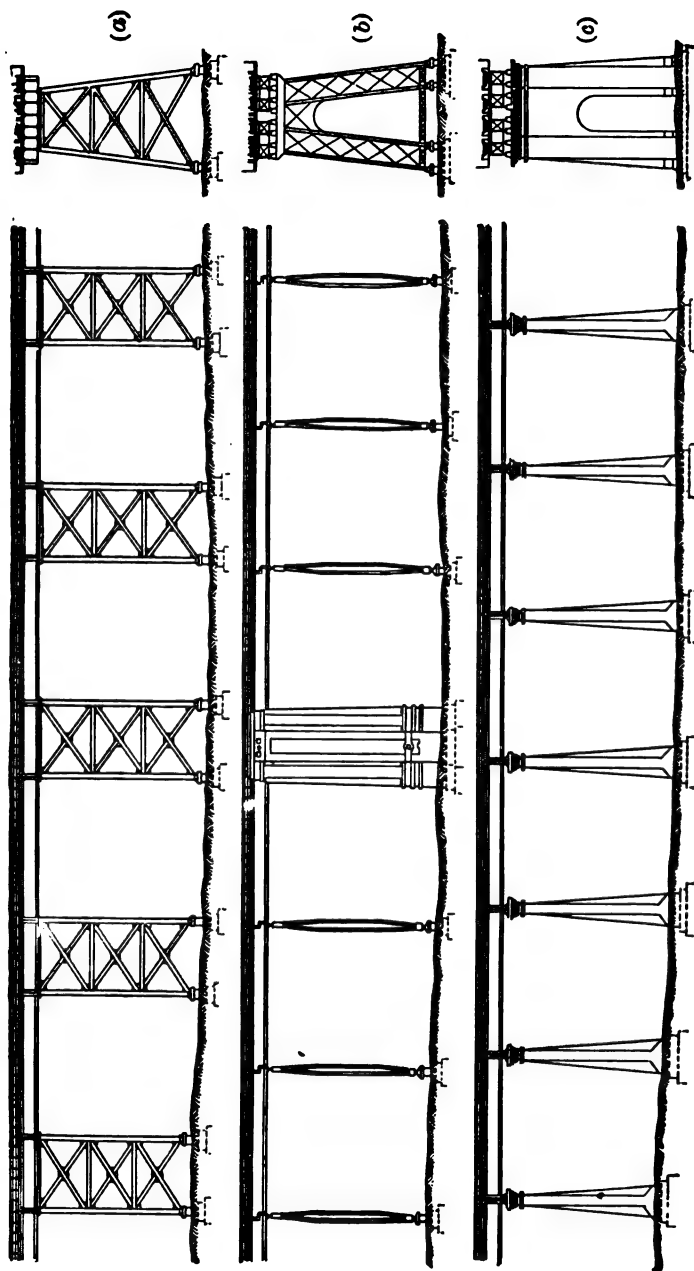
, b, c.—COMPARISON OF THREE DESIGNS OF PLATE GIRDER VIADUCTS. HELL GATE BRIDGE.
